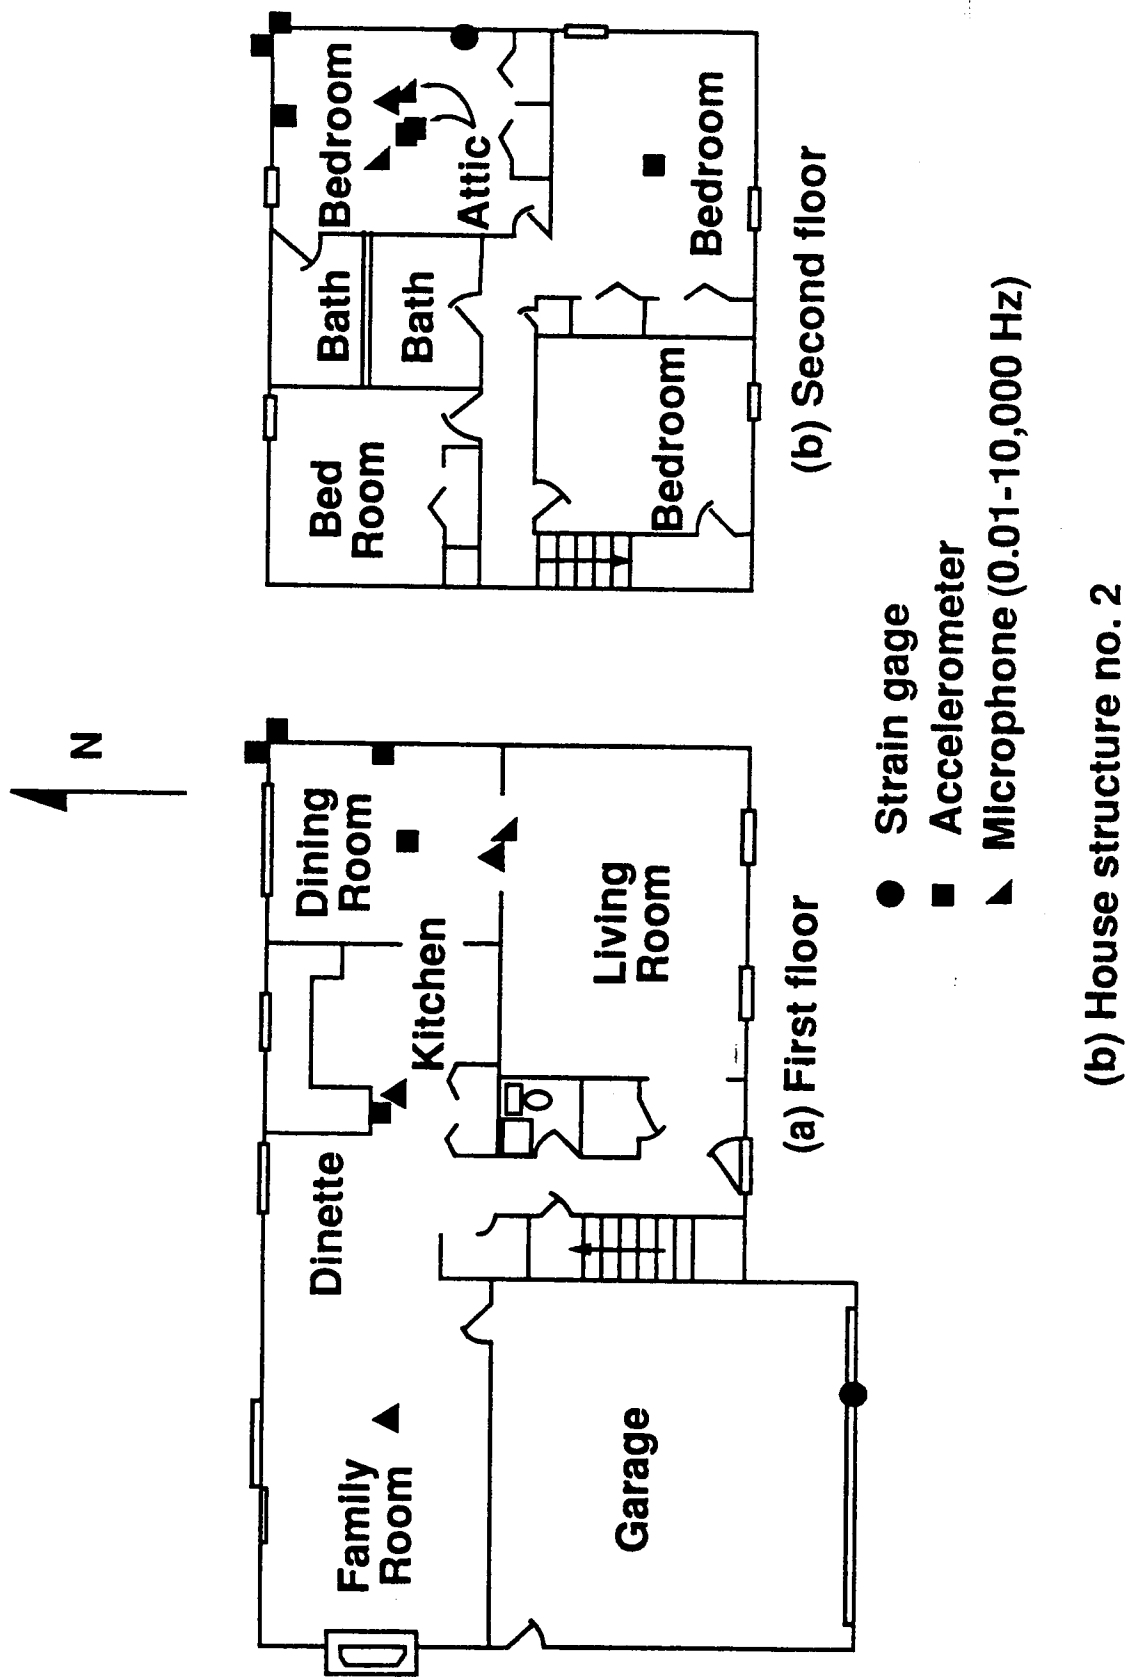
Floor Plan sketches of Test Structures Showing Locations of Instrumentation
